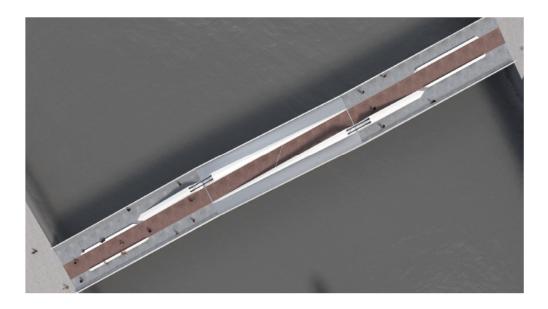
Plan View Montage showing segregated pedestrian and cycleways
